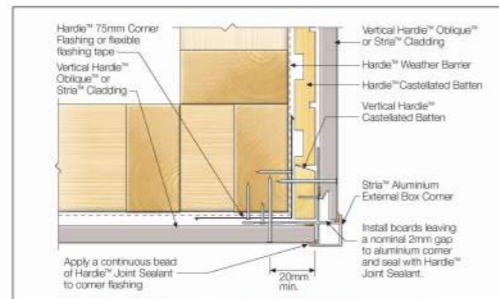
EXTERNAL CORNER BETWEEN VERTICAL AND HORIZONTALLY ORIENTED BOARDS
